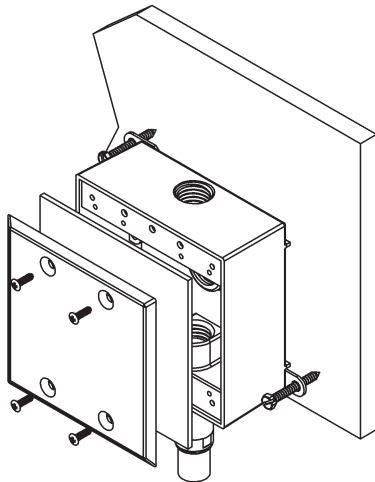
Outside Air Humidity in a Weatherproof (WP) Enclosure
